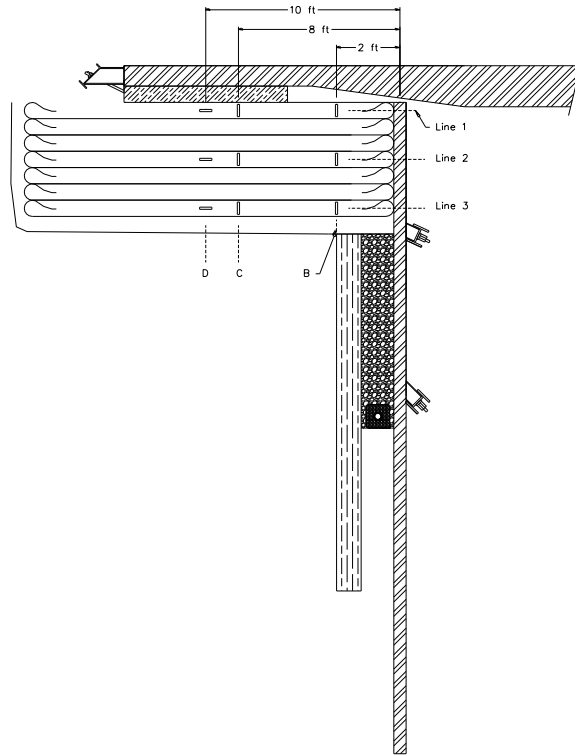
Cross-section of instrumentation in south sheet pile abutment system in TC
